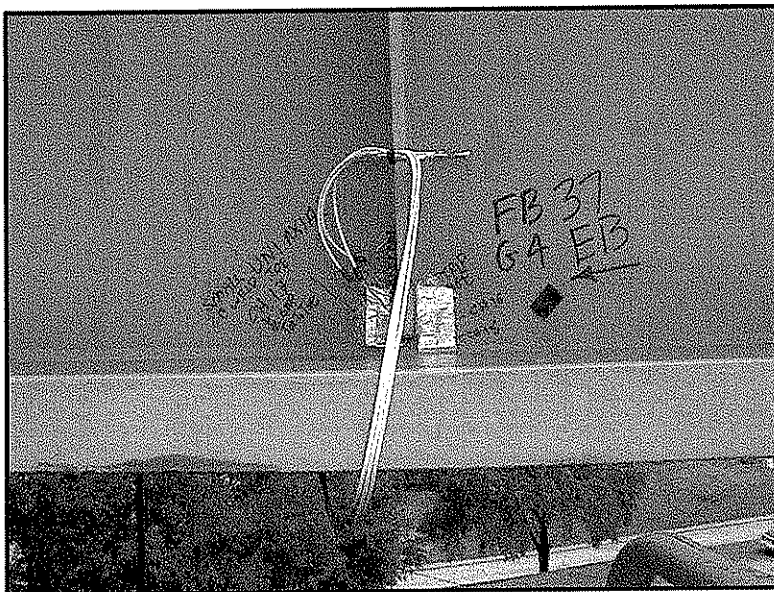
Photograph of typical gage installation at a bottom web gap on the surface opposite a floorbeam connection plate.
